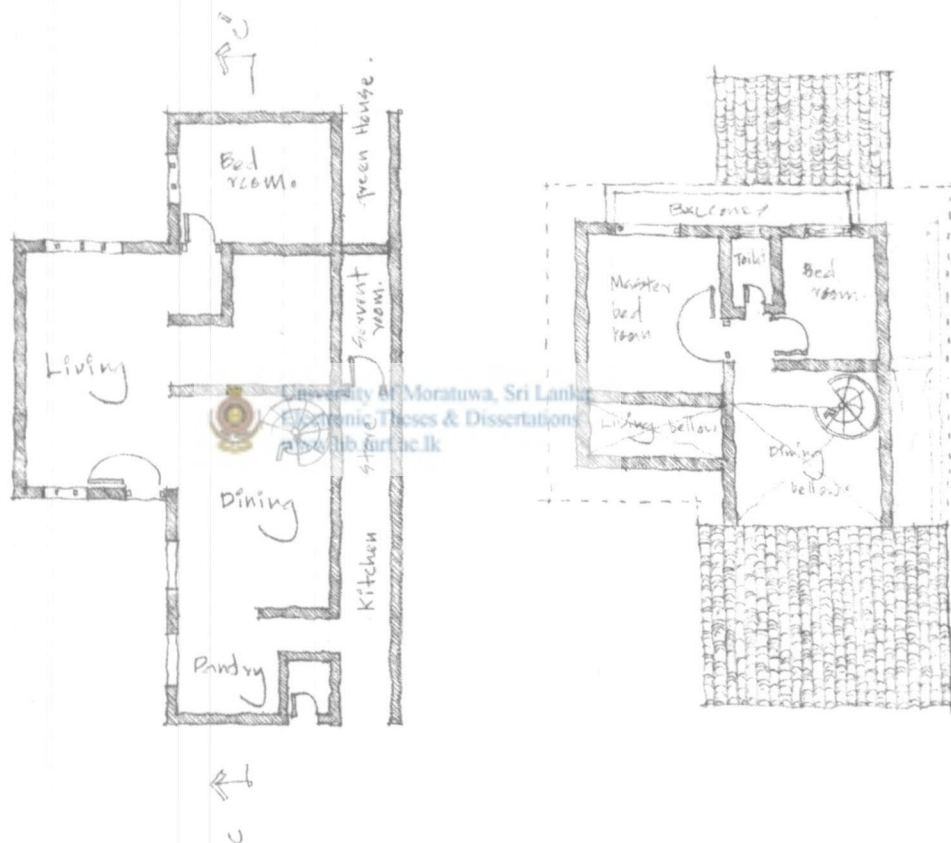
a) and b) : ground floor and upper floor - changed plans of House- 2. The addition of a kitchen, servant's room, bed room and a greenhouse is shown. (not to scale)
